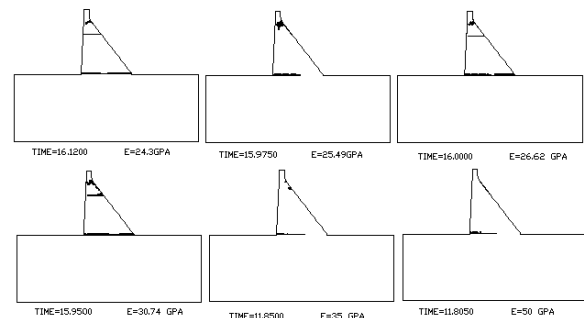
Crack profiles of system for massed foundation by varying E
